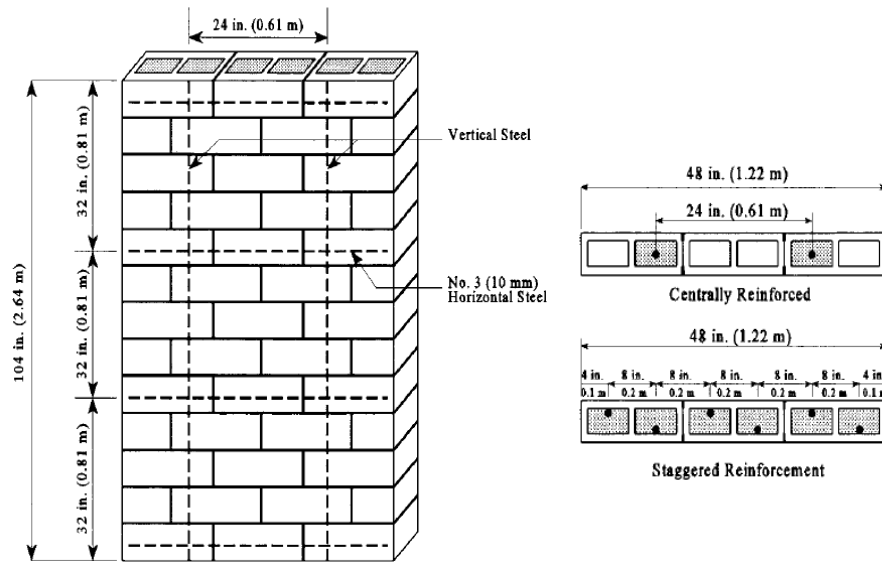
Specimen details of RM walls to test under out-of-plane loads (Abboud et al., 1996).
